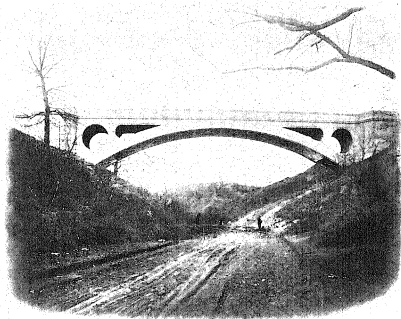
Ferro-concrete Bridge, Kahn System. Length of span, 128 ft.
